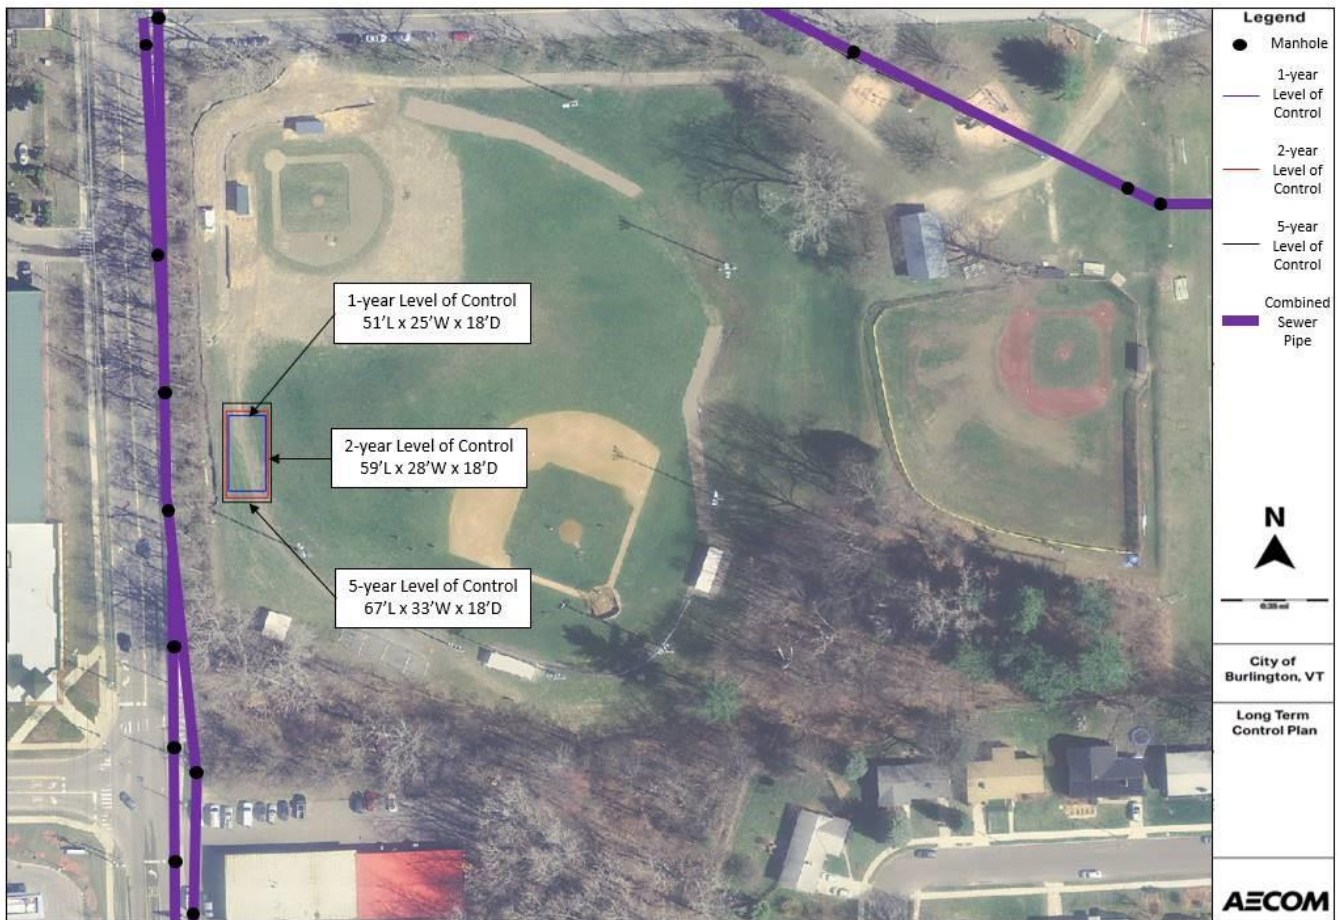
Pine Street CSO Storage Tank Layouts for 1, 2, and 5-year Level of Storms
